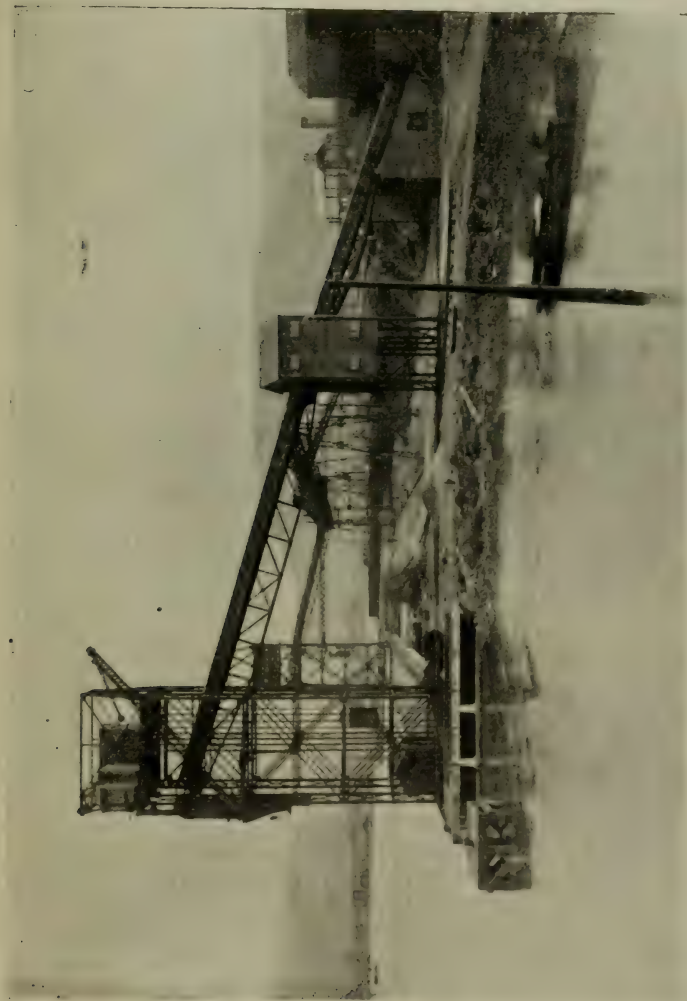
REINFORCED CONCRETE WHARF AT PORT TALBOT.
